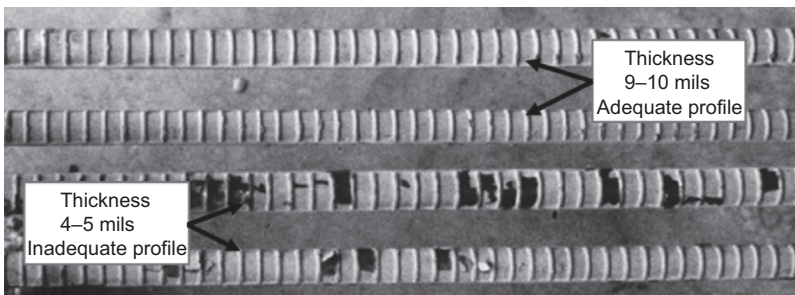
Bars extracted from concrete beams Yaquina Bay, Oregon. The top bars with suitable coating thickness show minimal corrosion, compared with the bottom bars that have poor coating thickness.
